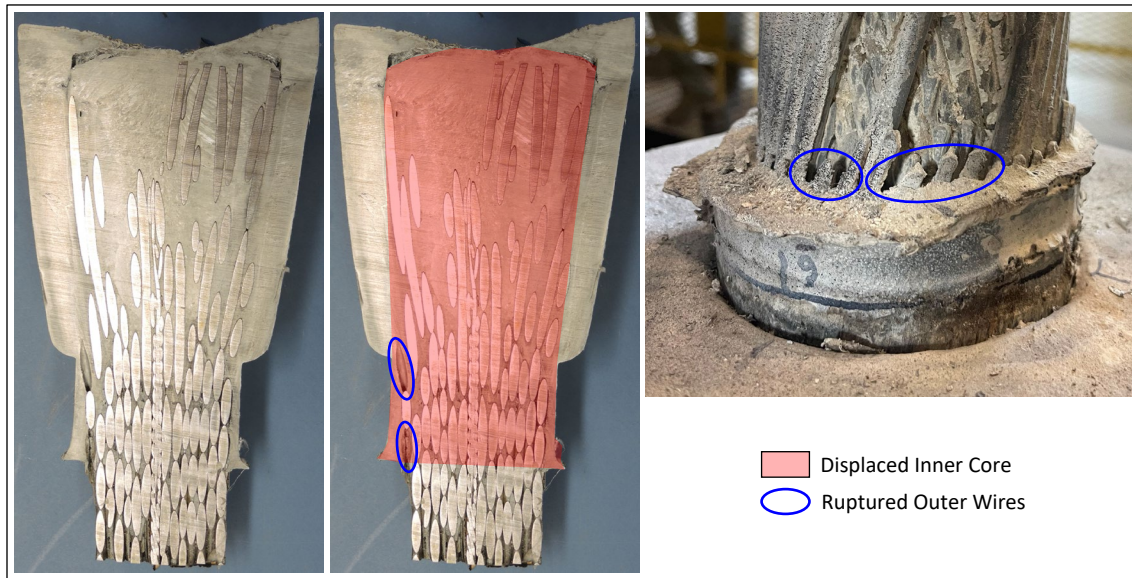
Displaced inner core slip and ruptured outer wire in socket B4S_G after tensile test to failure
